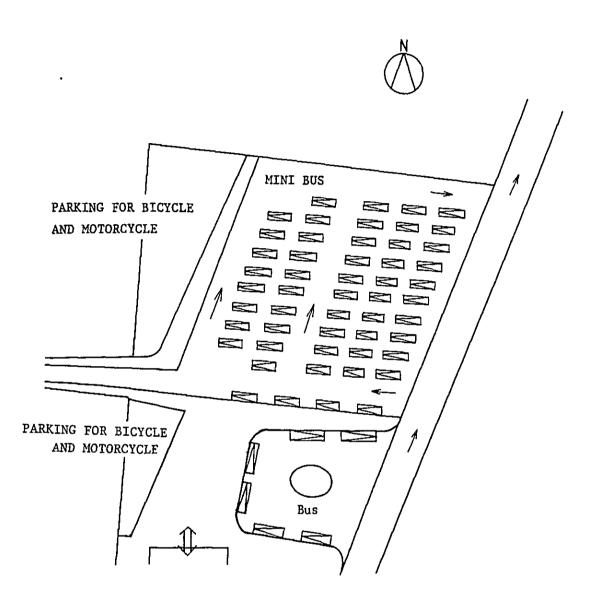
Layout of Station Front Plaza at Grogol Station S=1:1000
